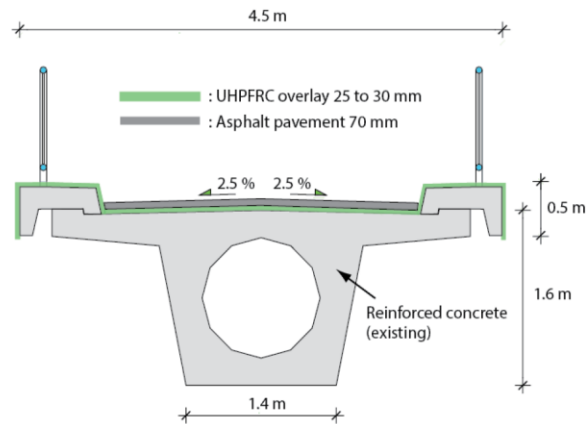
Cross section of bridge with concept of rehabilitation (Bruhwiler and Denarie, 2008)
